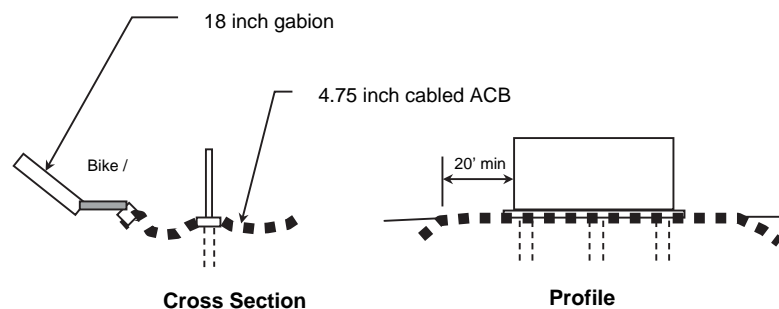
Guadalupe River pier/abutment scour countermeasure schematic diagram.
